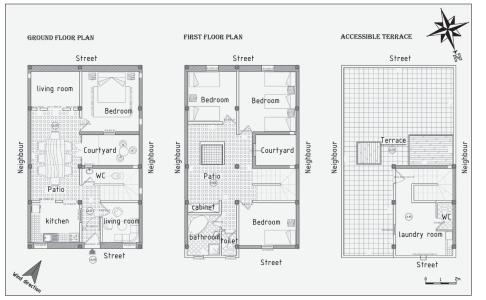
Architectural plans (dwelling ksar Tafilelt)
